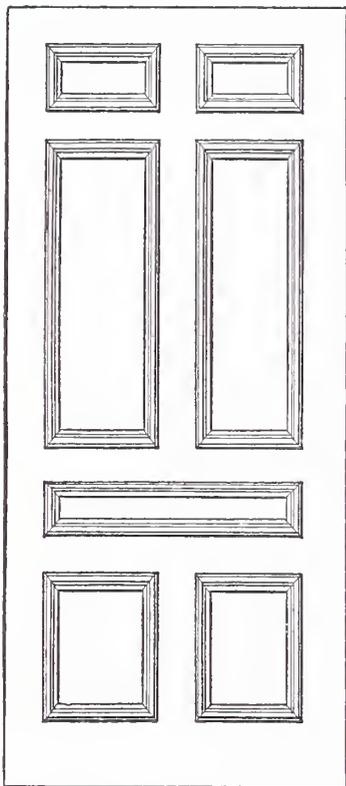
Elevation of Front Door.—Scale, 1/2 Inch to the Foot.
